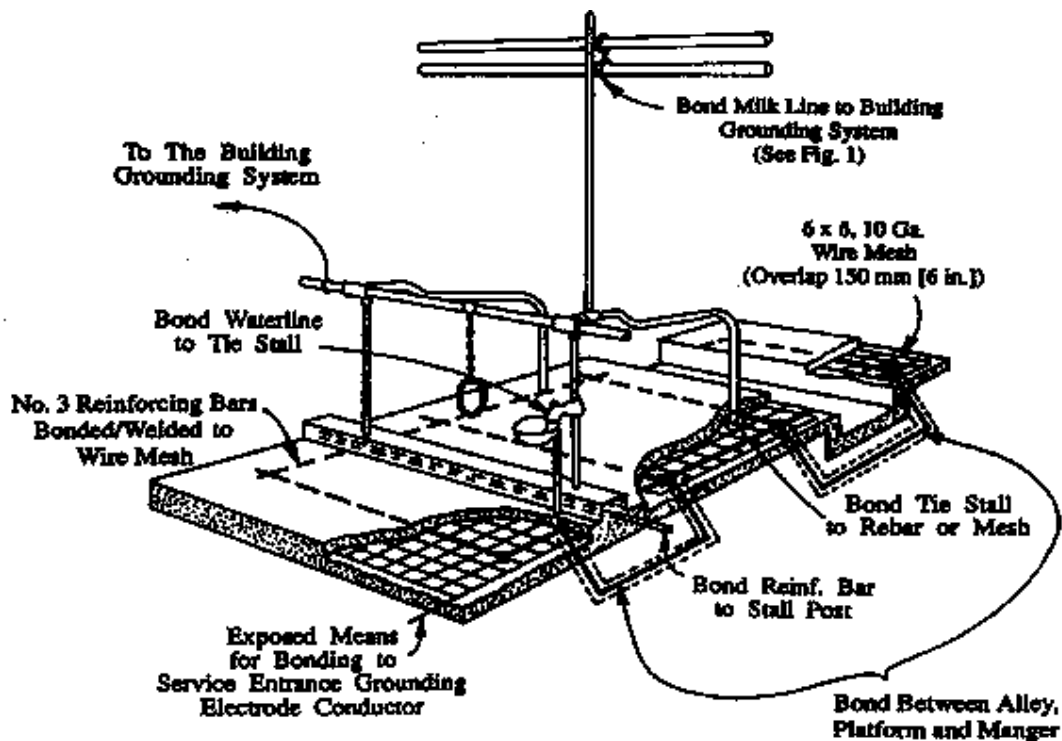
Equipotential plane installation in stanchion/tie-stall barn
